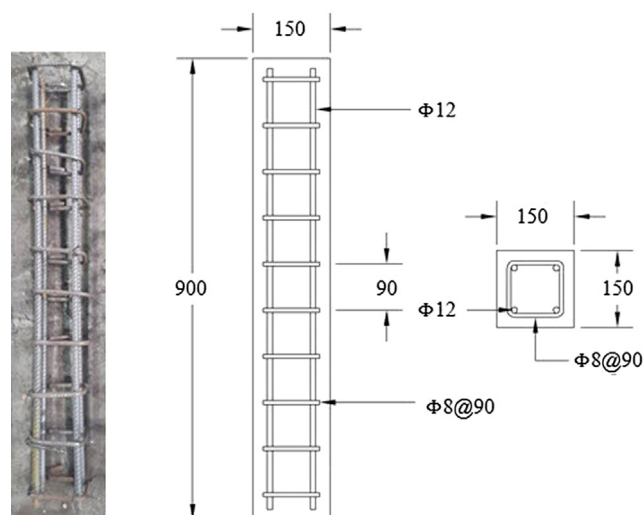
Reinforcement details of column specimens (dimensions in mm).
